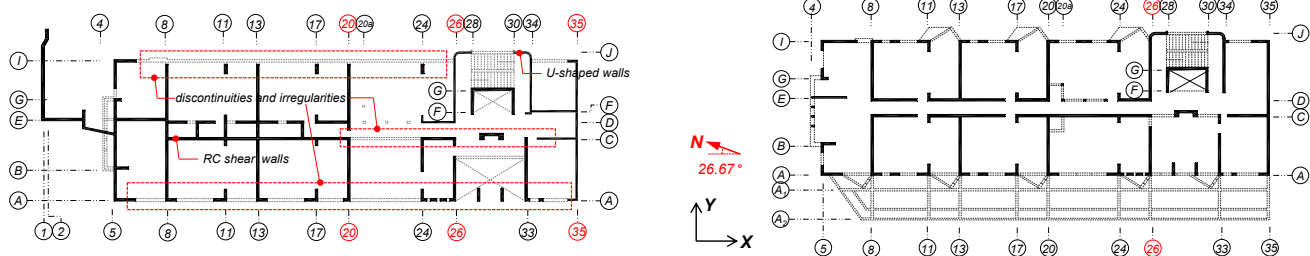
Structural plans: (a) first floor level (Level F0); (b) second floor level (Level F1)
